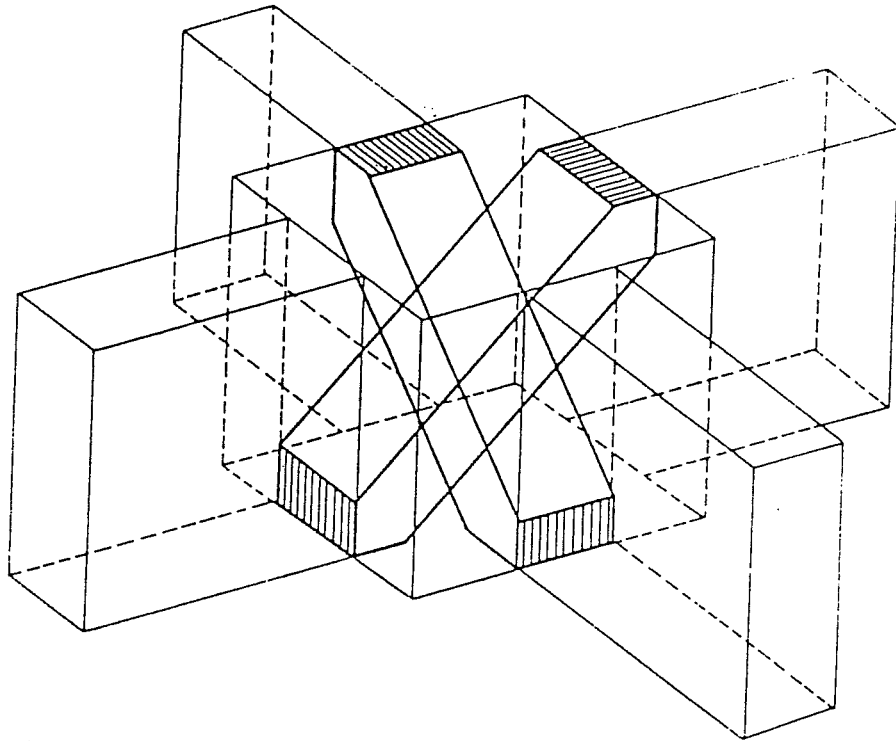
Strut for BCJ11 - Narrow beam specimen
